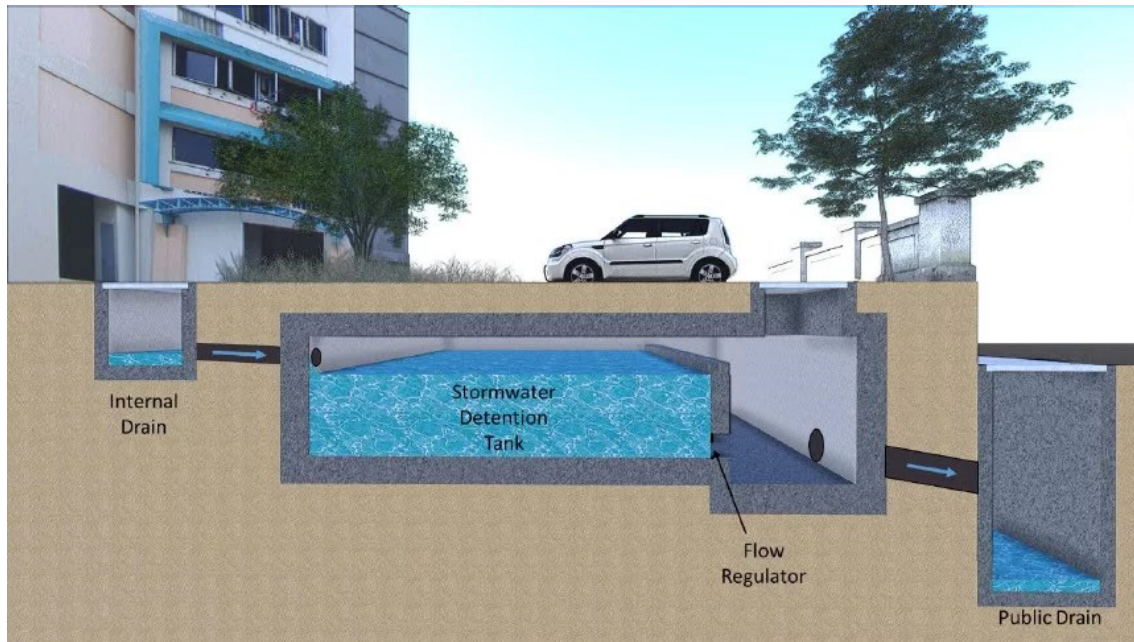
Alternative E: concept of underground storage tanks for detaining peak storm flows. Photo credit: (Stormwater Sydney, 2024)
